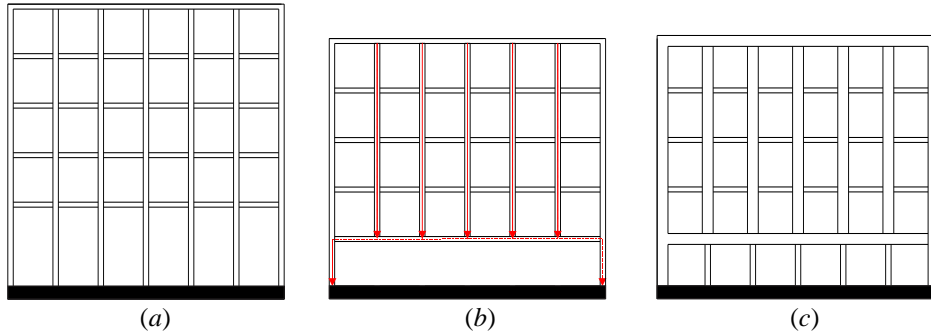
Weak ground floor: (a) flexible ground floor; (b) discontinuous load transfer; (c) heavy upper structure.
